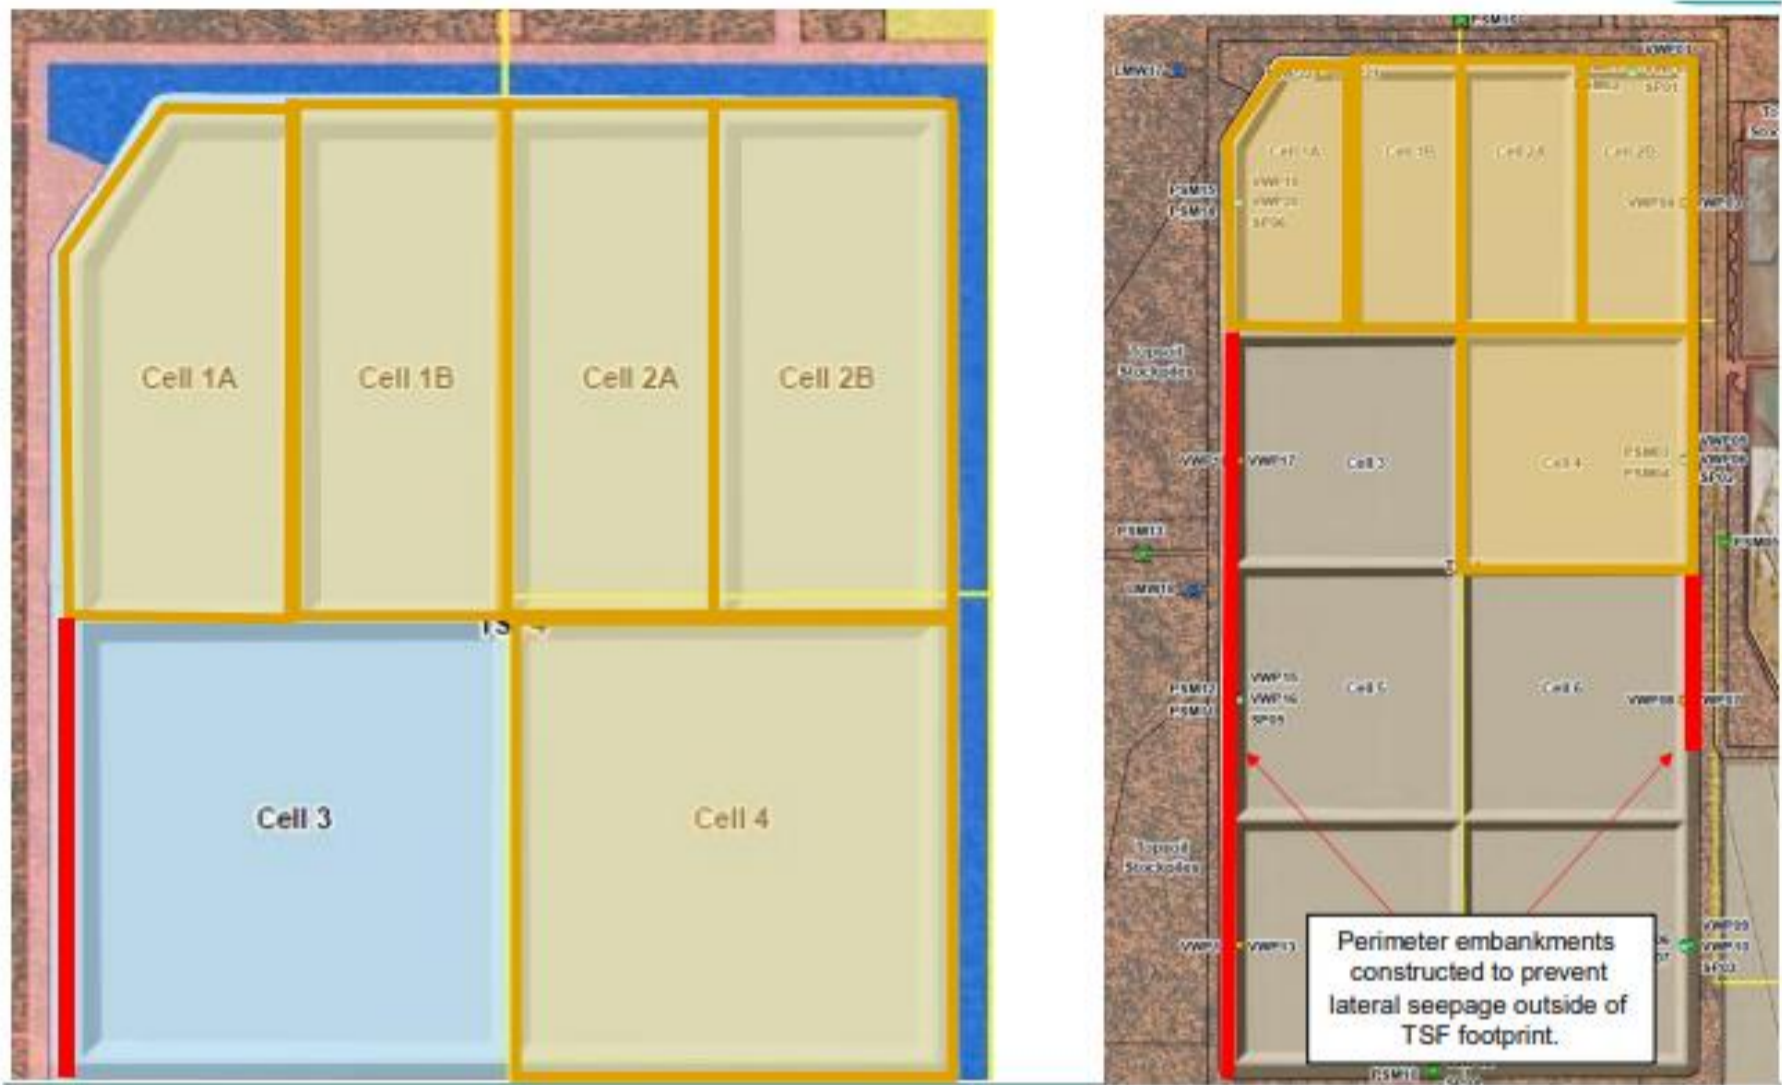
Plan showing Stage 5 of the TSF construction – Cell 4 construction
